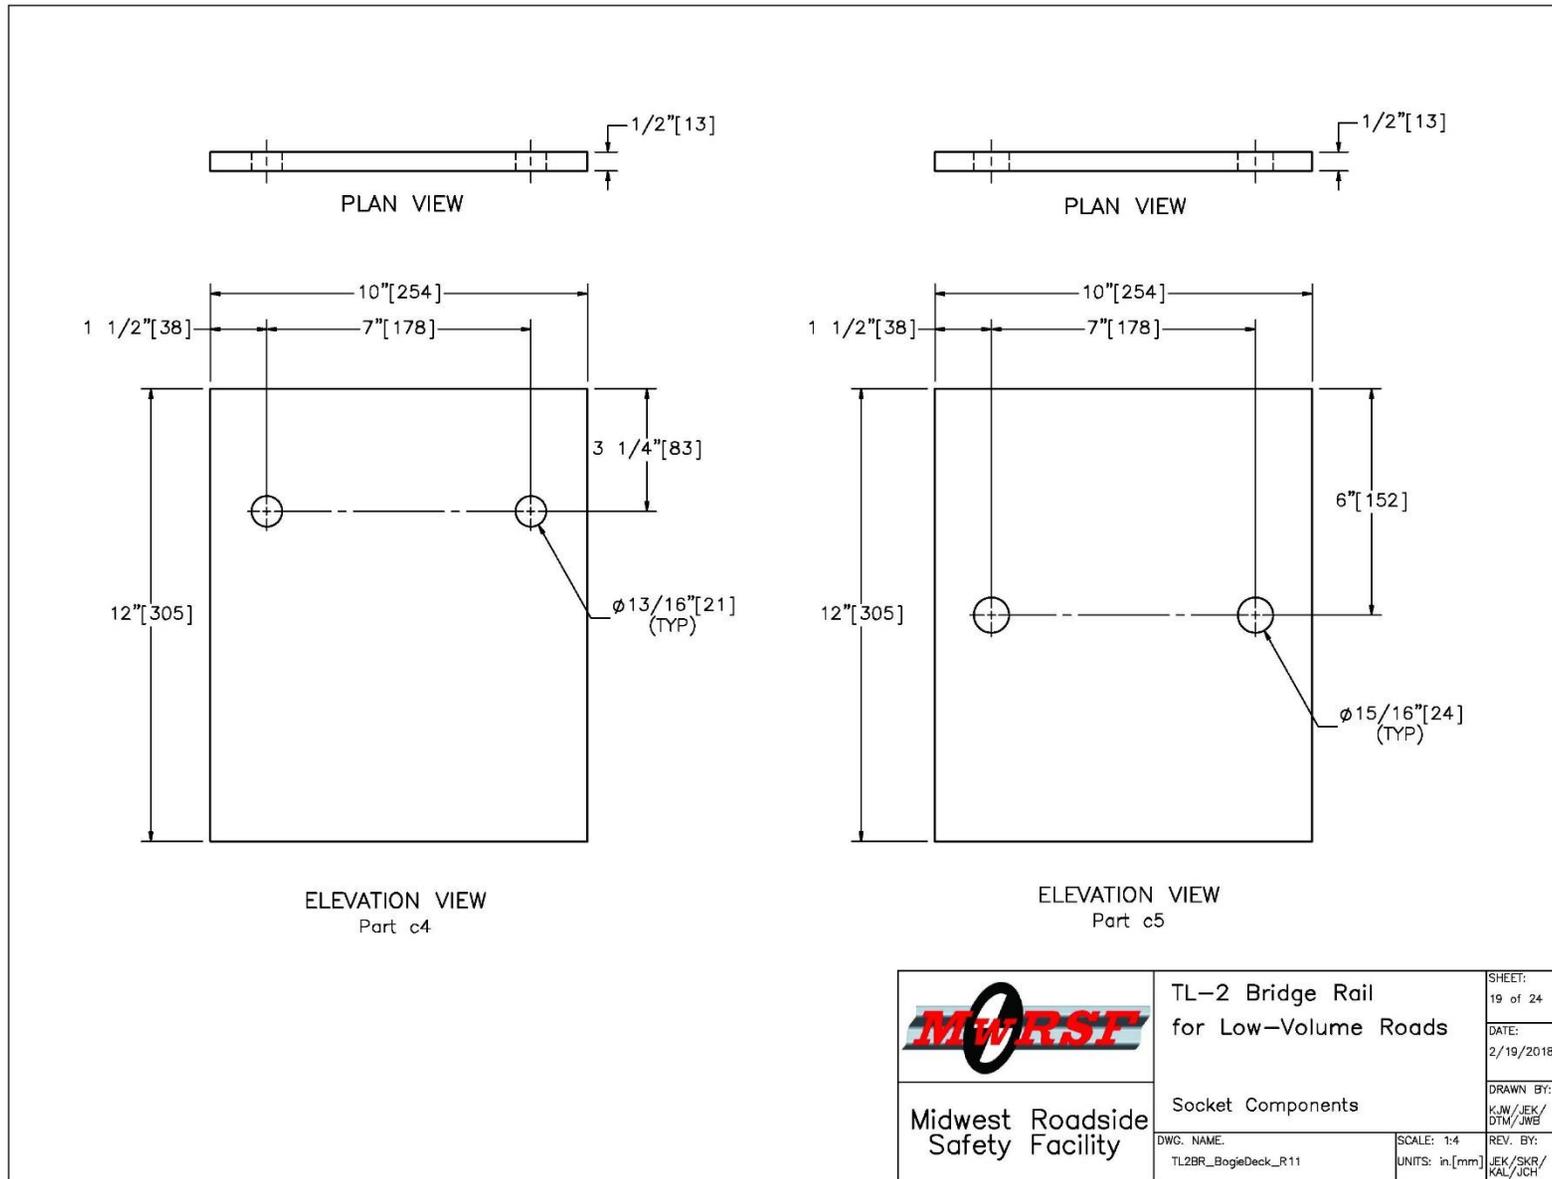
Bogie Testing Matrix and Setup, Socket Components
